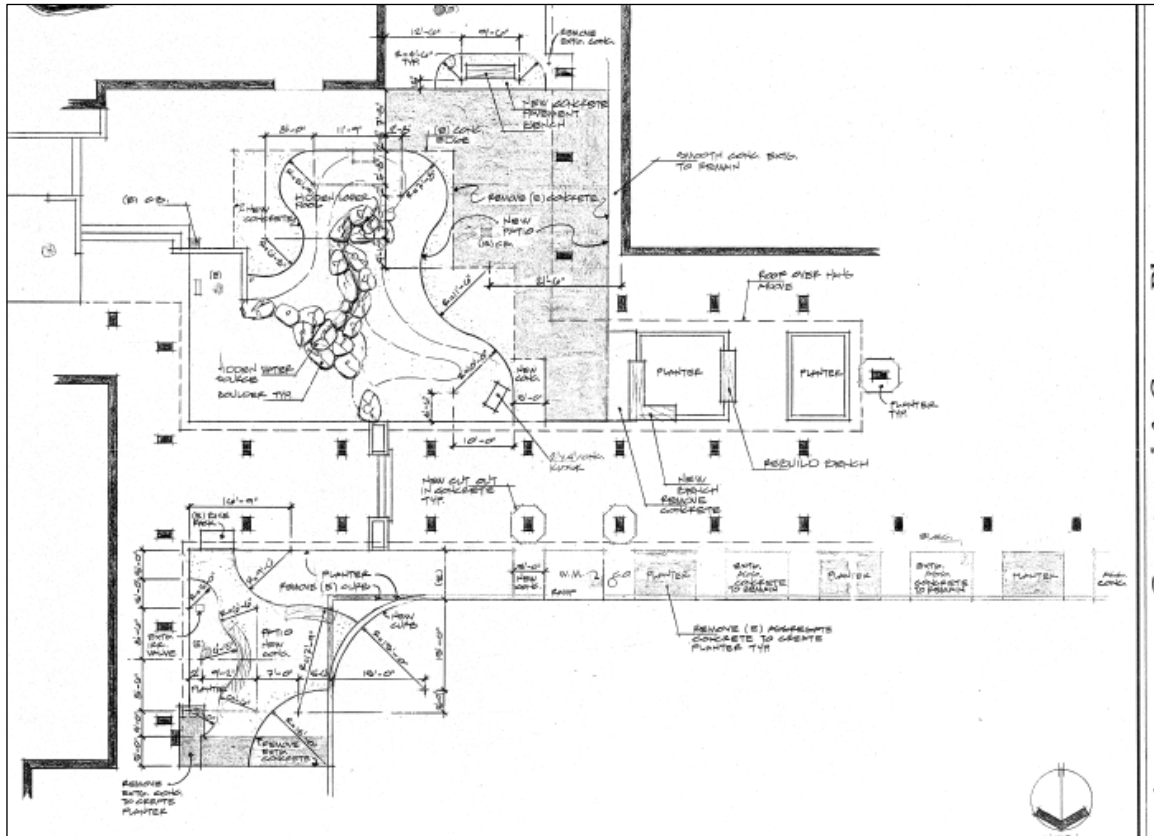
Central courtyard renovation, showing work done in 1995 to landscape the area between Buildings B-1 and B-2, and C. *Courtesy Property Owner.
